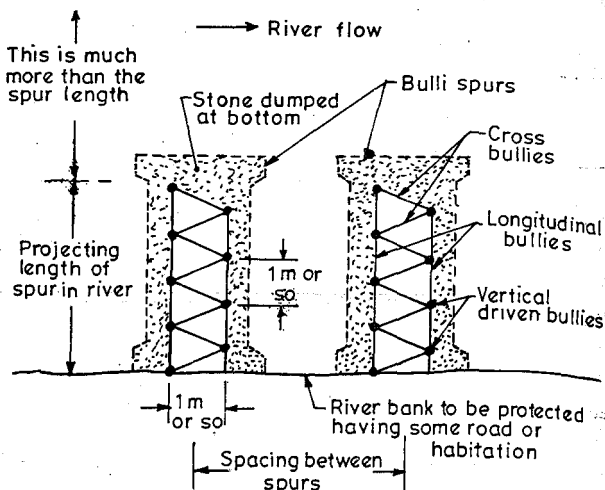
Plan view of Balli spurs constructed in a river.
